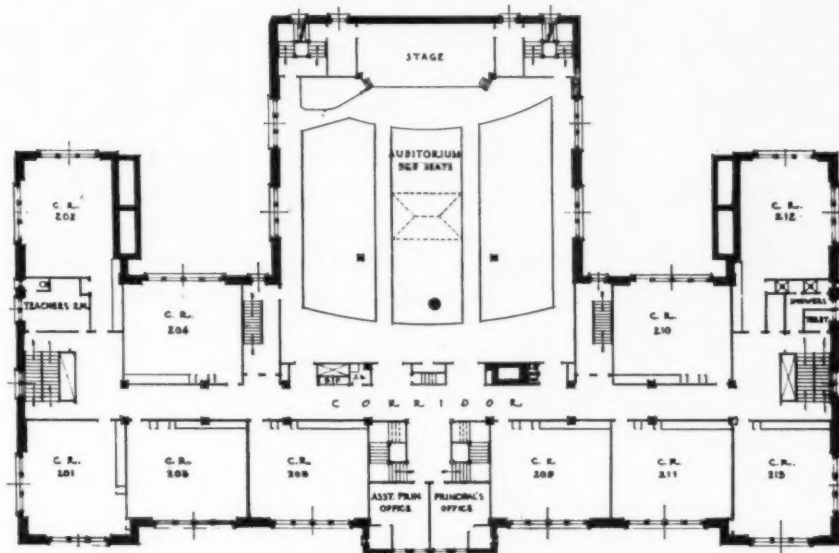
SECOND FLOOR PLAN. TYPE "A" ELEMENTARY OR INTERMEDIATE SCHOOL
